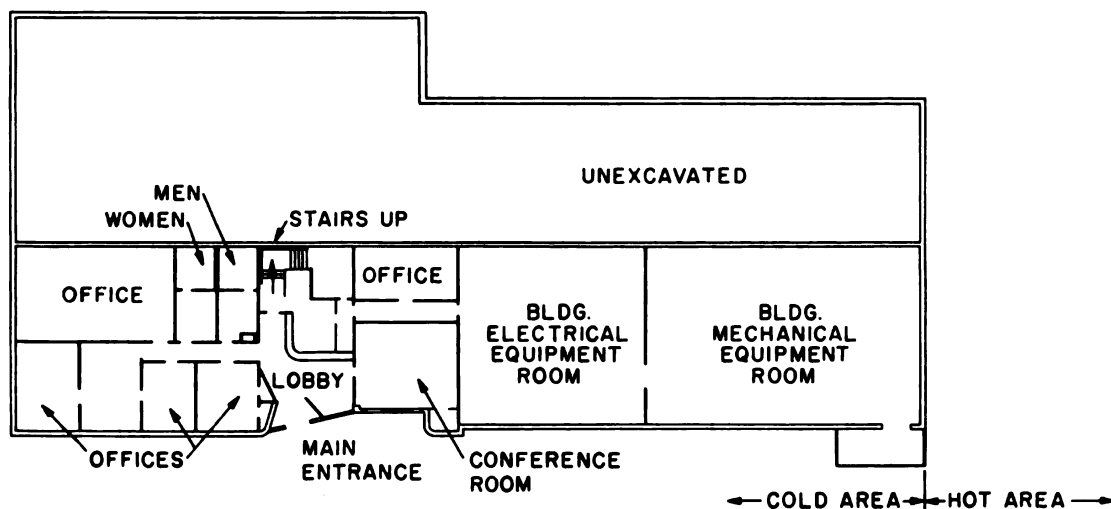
Ground-floor plan of cold area located directly under part of the main-floor cold area. The building is constructed on a hill, situating both the ground-floor and the main-floor hot area at ground level.
